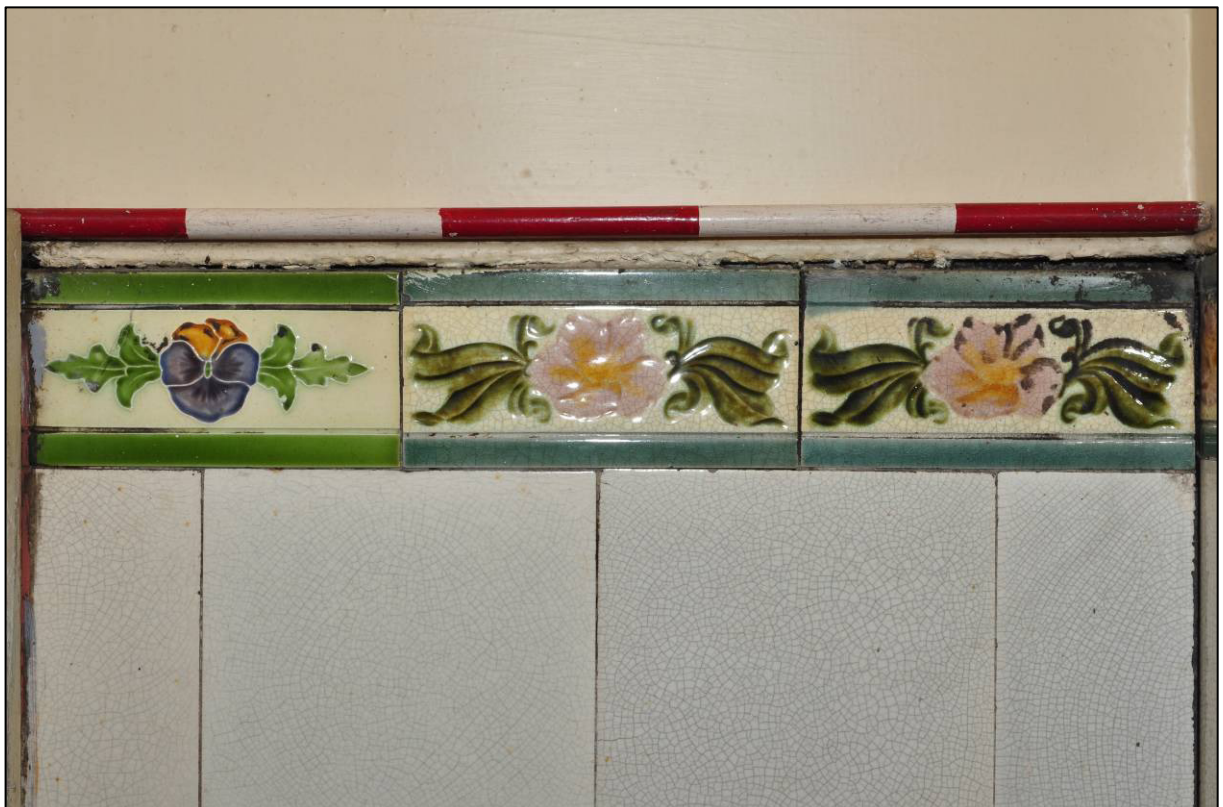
c.1897-99 Higher Grade Girls' School, classroom/cookery room (1F25), decorative tiles to recess in N wall, looking N (photo 2390).
